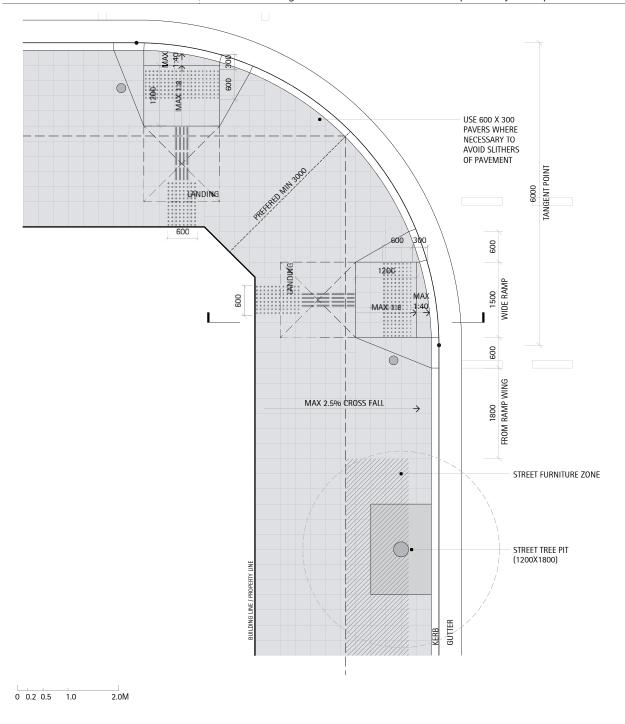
Streets Corner Plan: 6000 Radius 1500 Ramp
